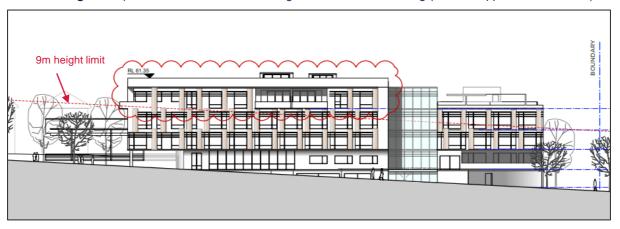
| Northern elevation of boarding accommodation building (Source: Applicant's RtS 2020)
